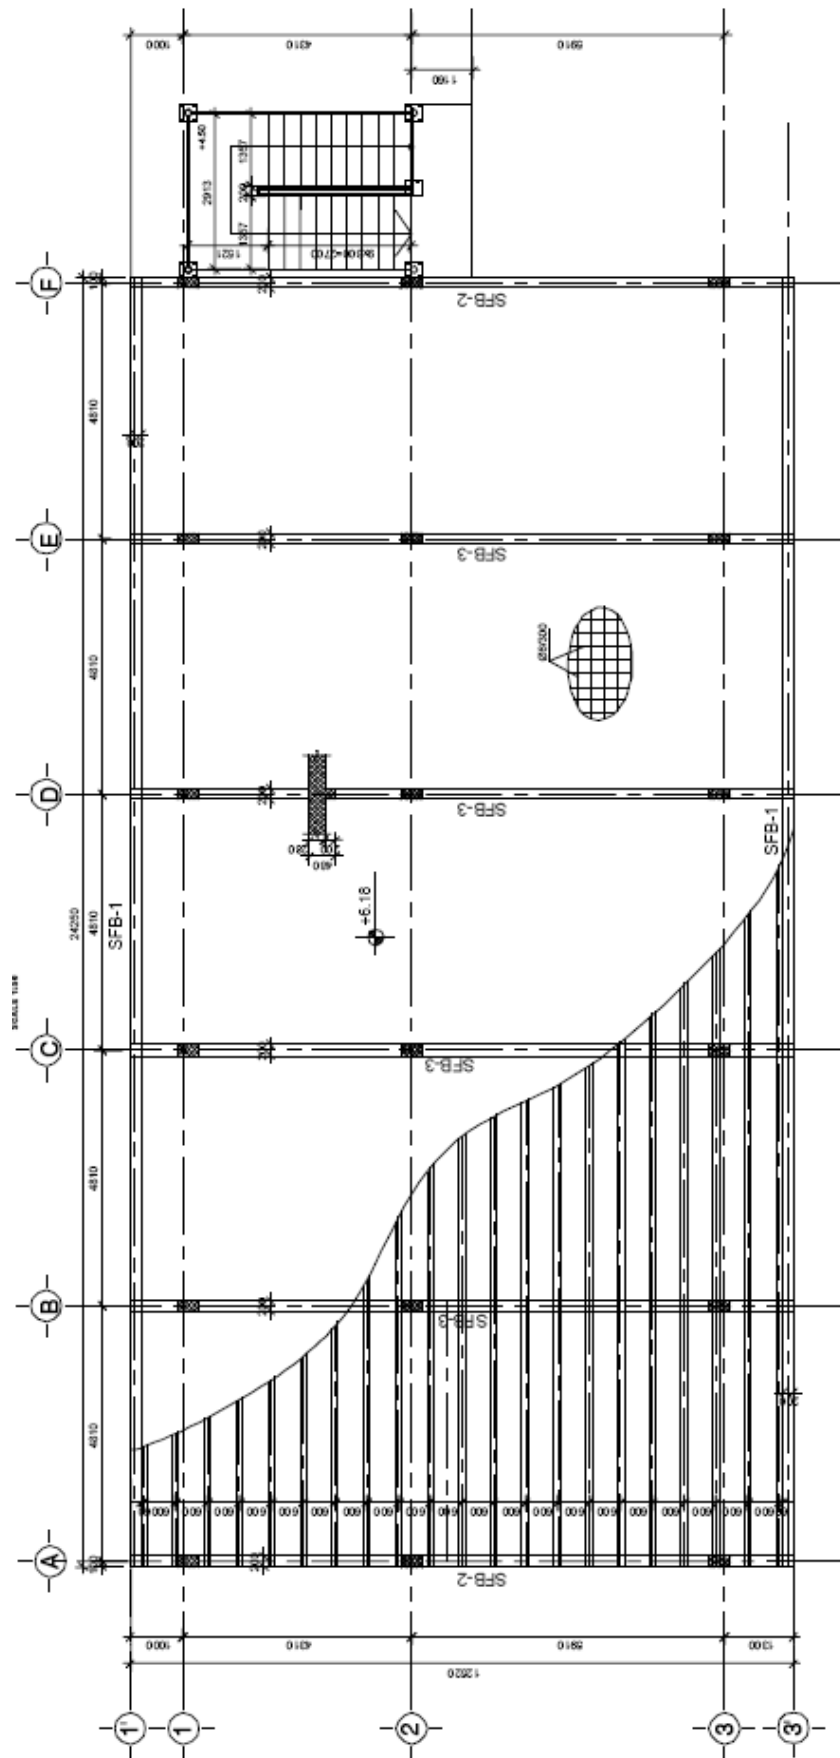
Second Floor Pre-cast and Beam Layout
